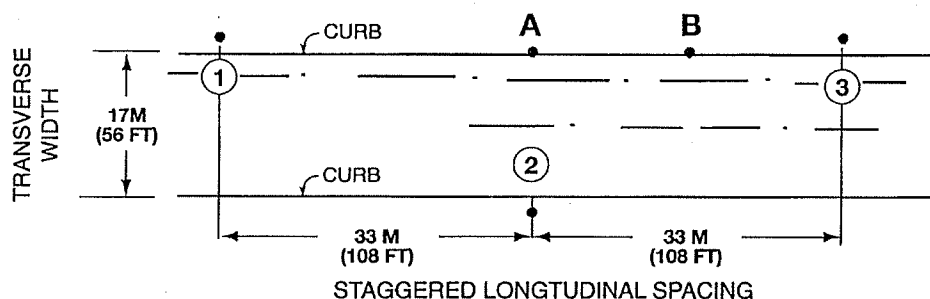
A luminaire and parking lot layout (assumed for typical computation) that uses a staggered arrangement of luminaires.
